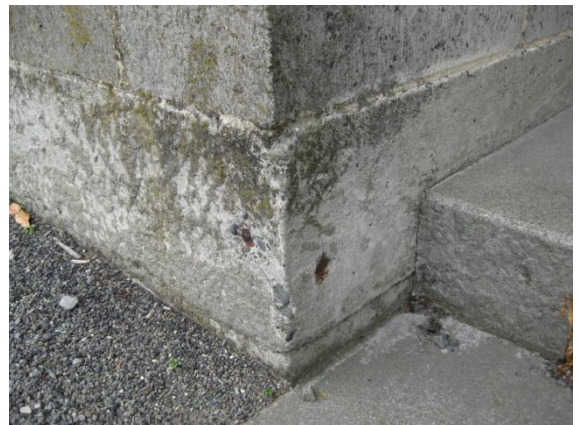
Typical exposed reinforcement in the corners of the building. Note corrosion of the reinforcement
